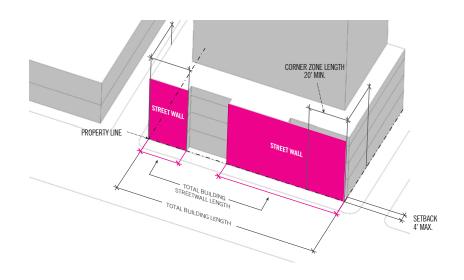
Streetwall Articulation: Perimeter Streets
